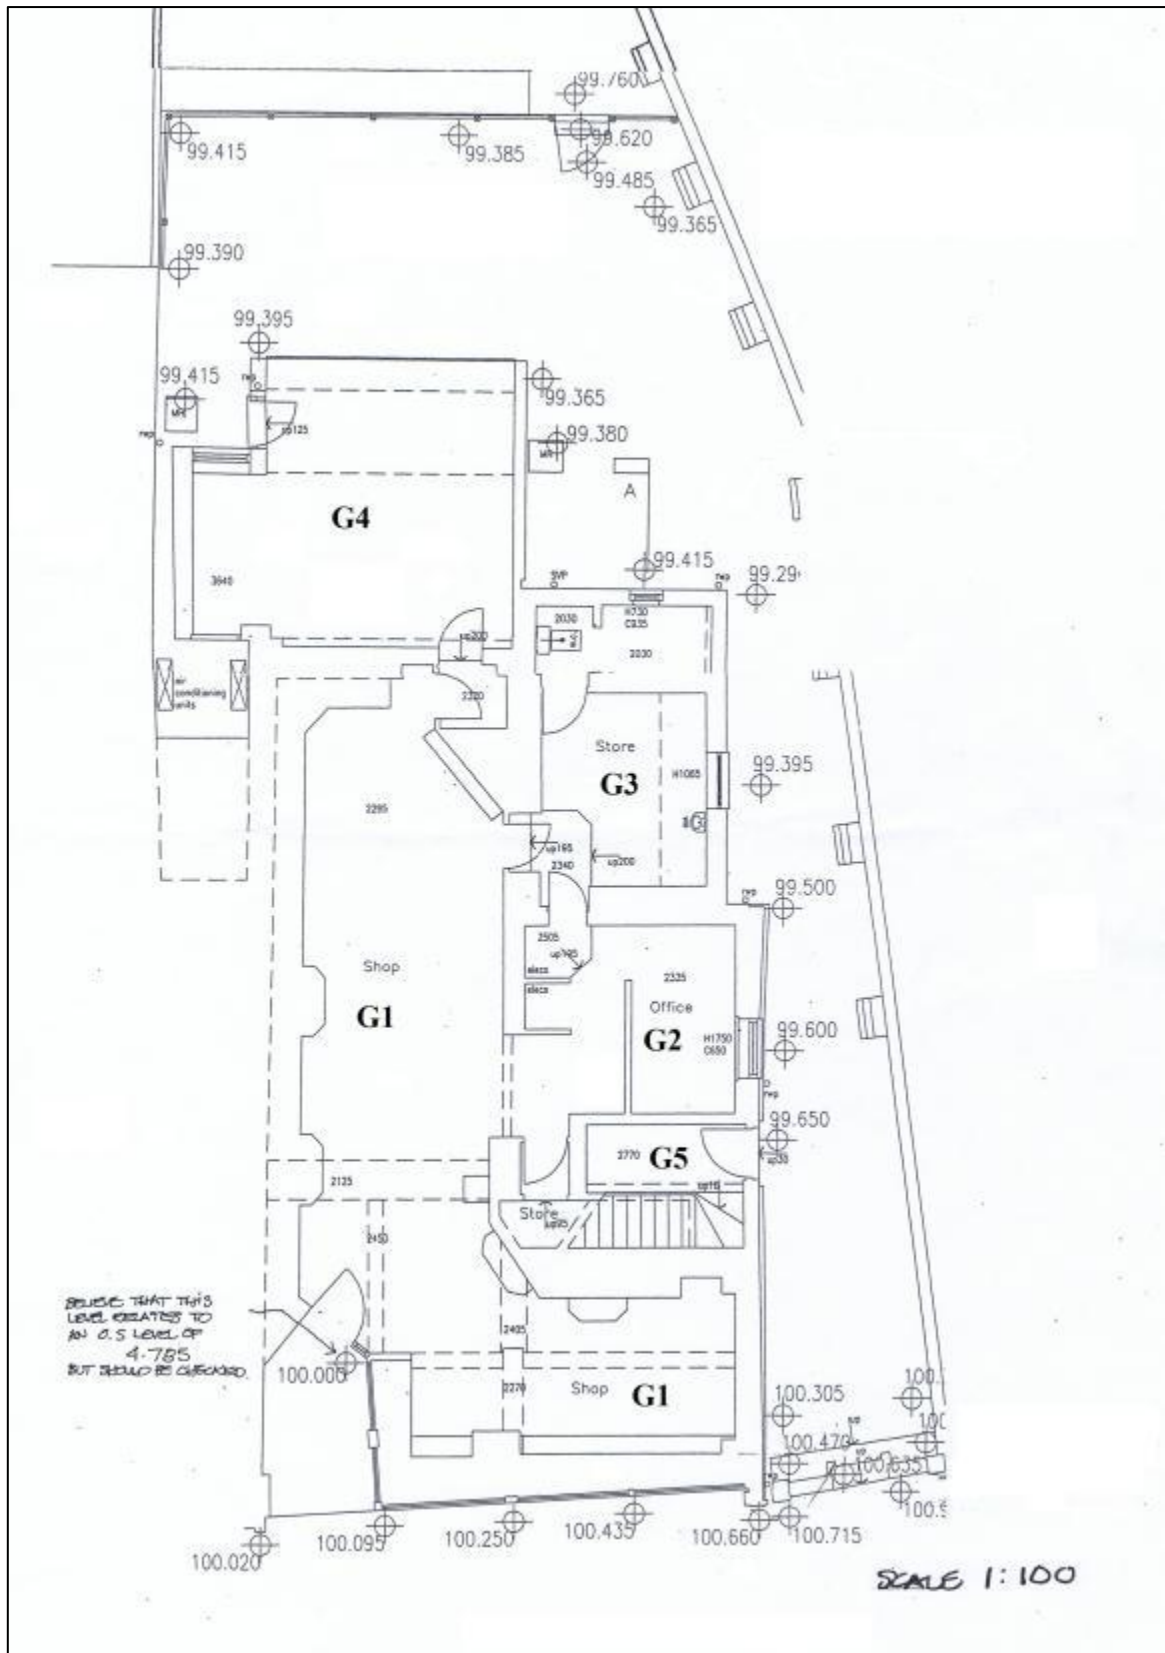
224 High Street, Lewes: Ground Floor Plan
